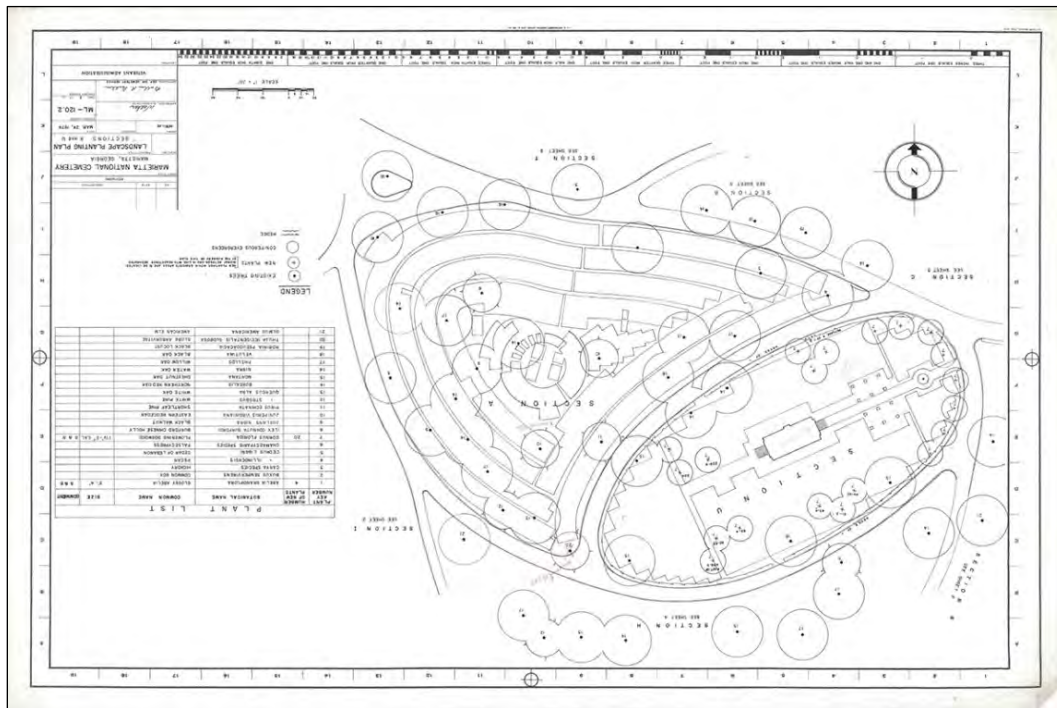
Planting plan for Sections B, C, Q, and T, 1974 (NCA Archives).
